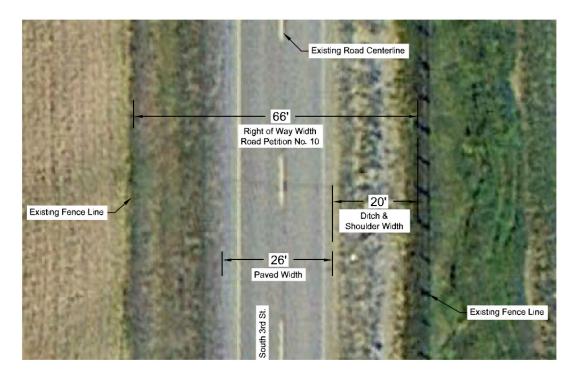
Representative plan view of the existing road conditions along South 3rd Ave.
